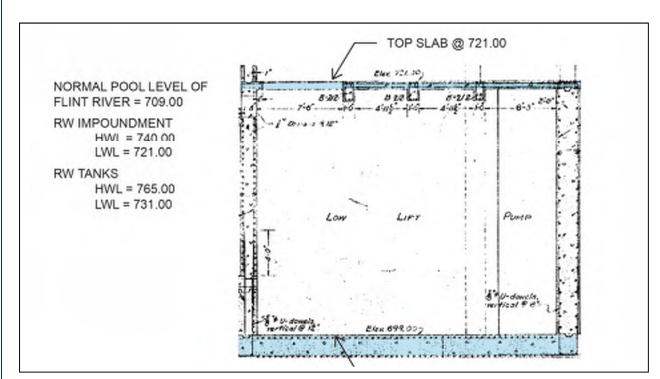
Existing Raw Water Pump Station Suction Chamber Section View
